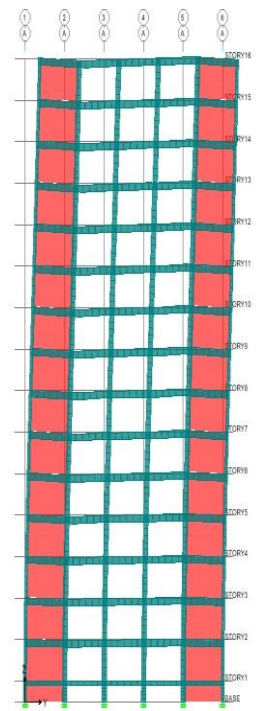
Deformed shape of G+14 storey ESW model in y-direction
